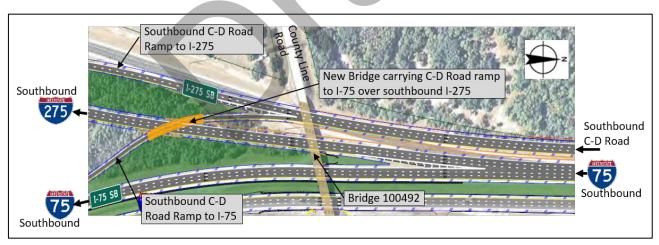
Alternative 2-Diverge Points for C-D Road & I-75/I-275
